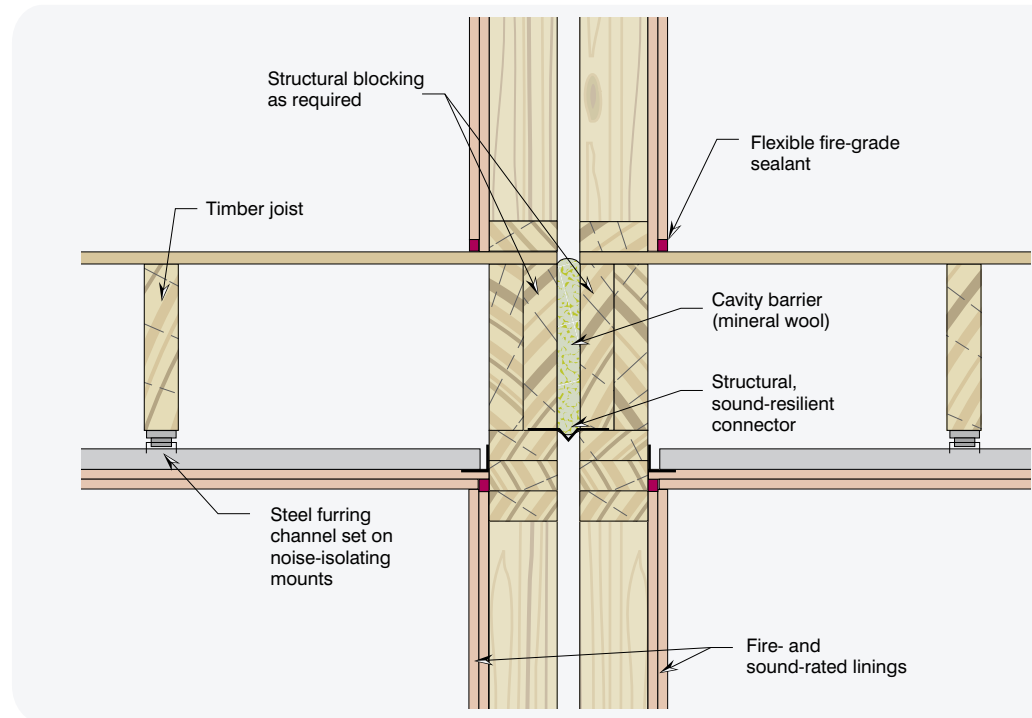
Cavity barrier at the junction of fire-rated floor and fire-rated wall – elevation view.
